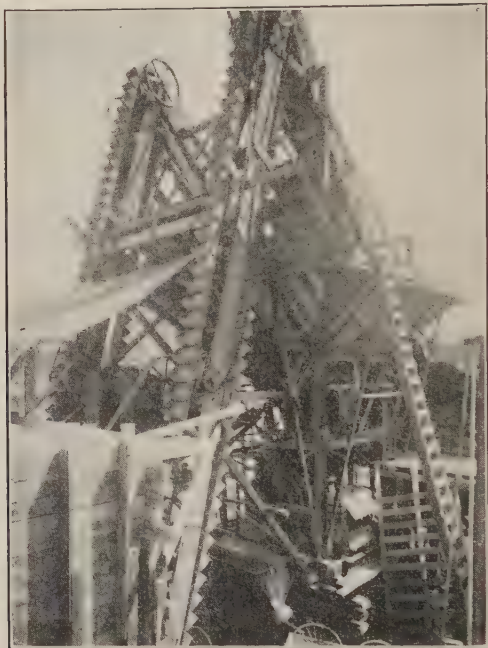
A mixing plant on the Wacker Drive improvement.
